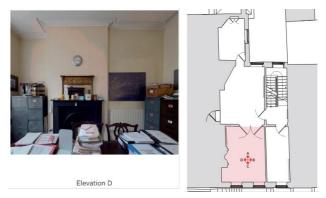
(top) and 15 (above) showing current first floor front rooms with no panelling, later cornice, lowered ceiling and modern fire place
